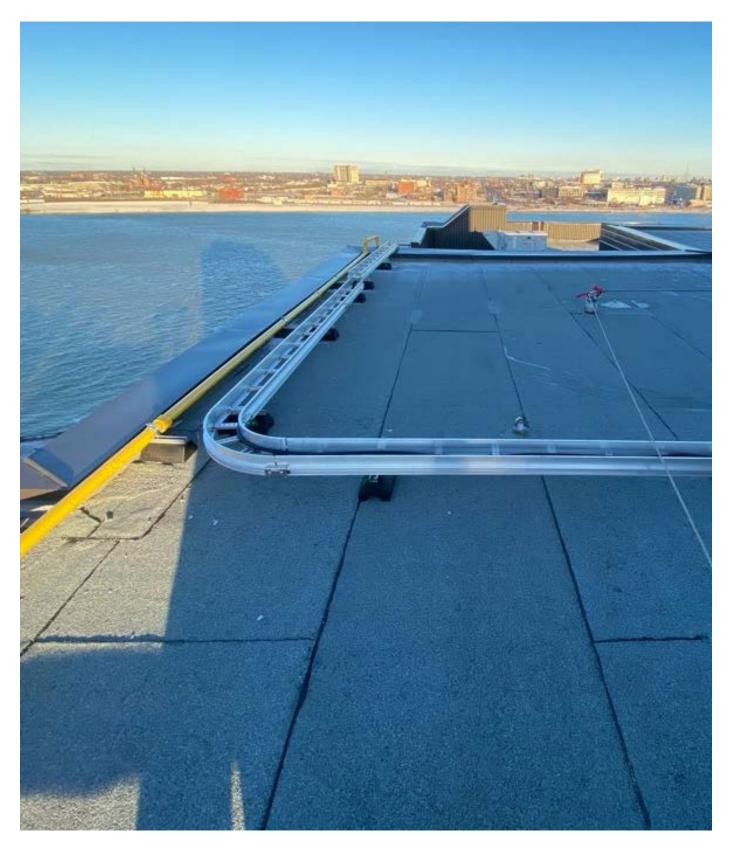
Flat Roof Replacement with Insulation Upgrade to R30 at 140 Bridge Completed in 2024
